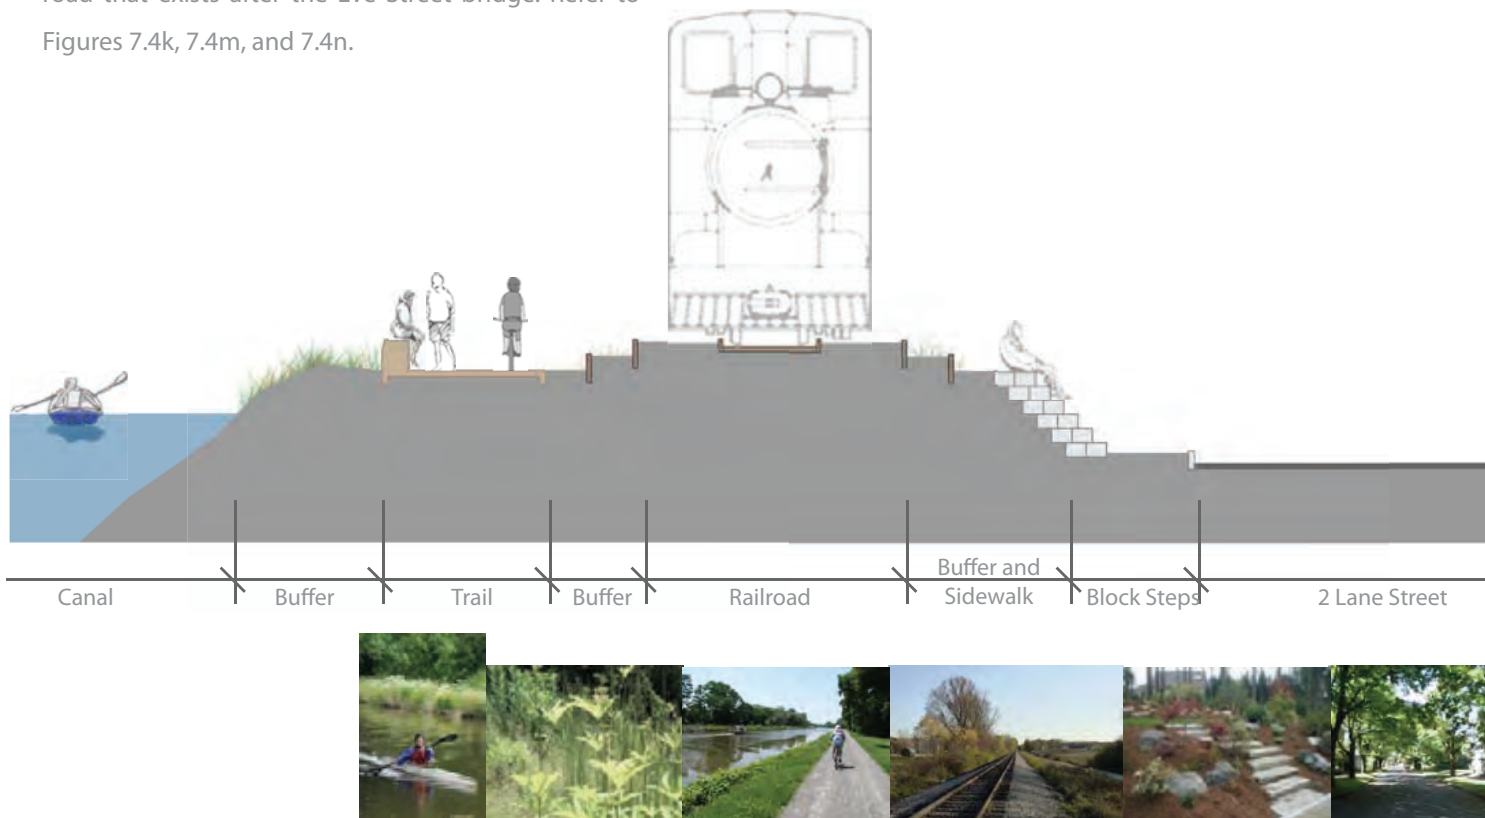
Typical Section Through Proposed Division of Parcels and Reorientation of New Development to Address the Canal
